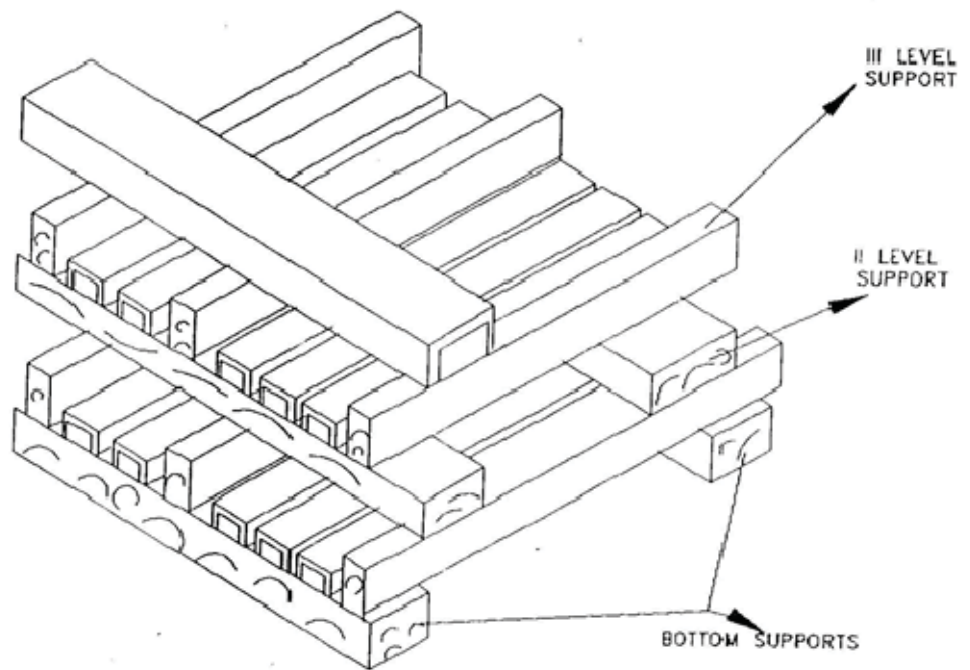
STRUCTURAL STEEL STACKING ARRANGEMENT
